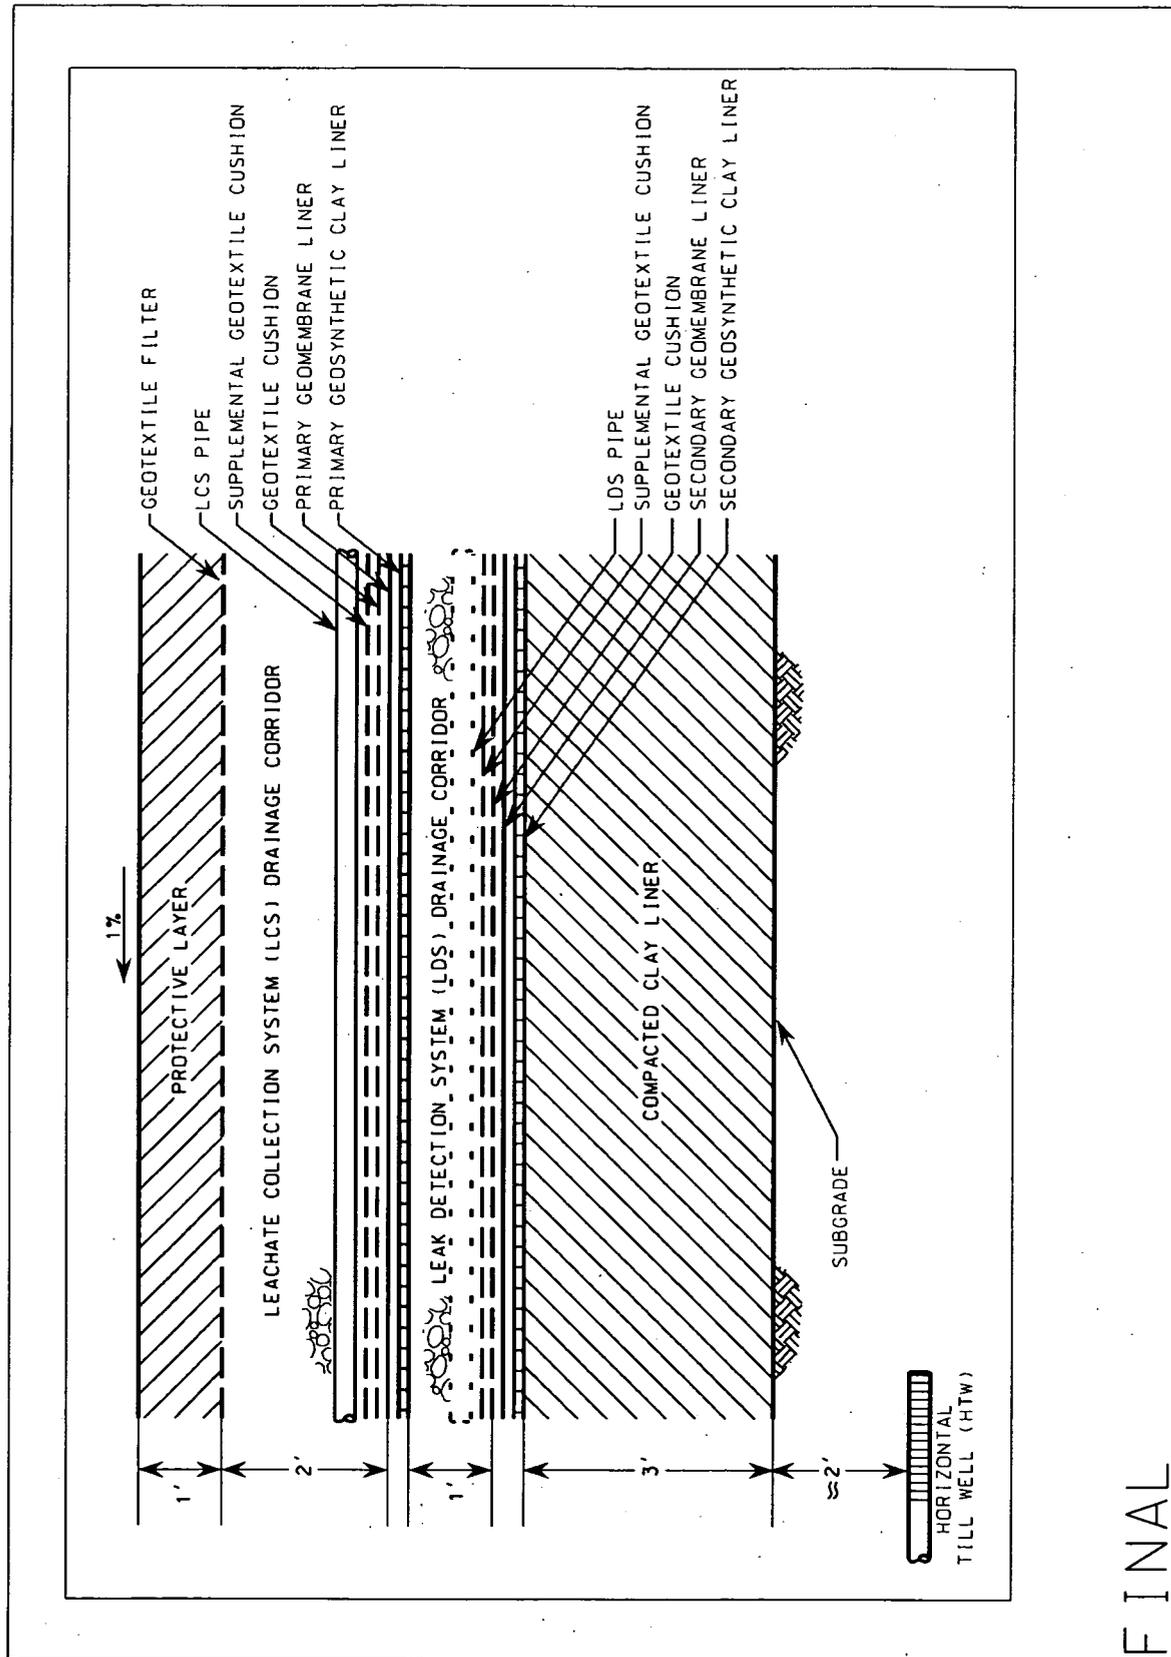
On-Site Disposal Facility Liner System with HTW at the Drainage Corridor
